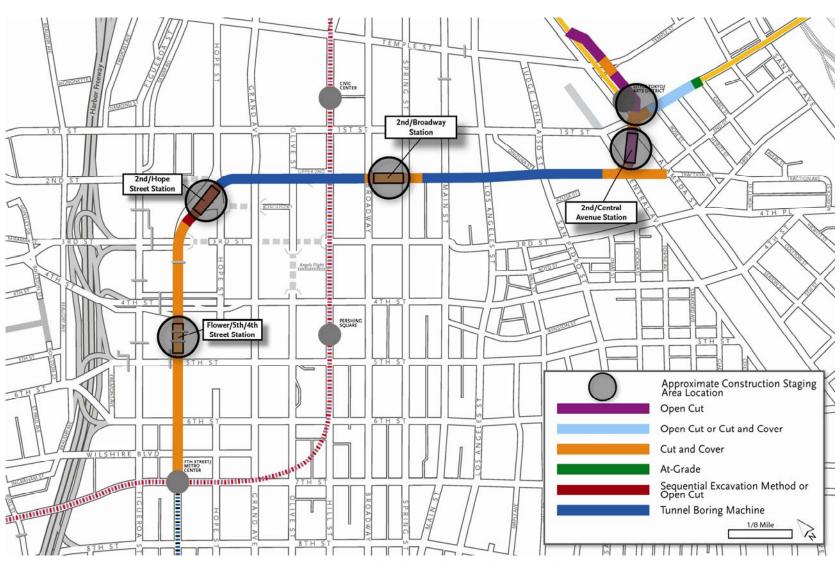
C Construction Methods (Fully Underground LRT Alternative)
